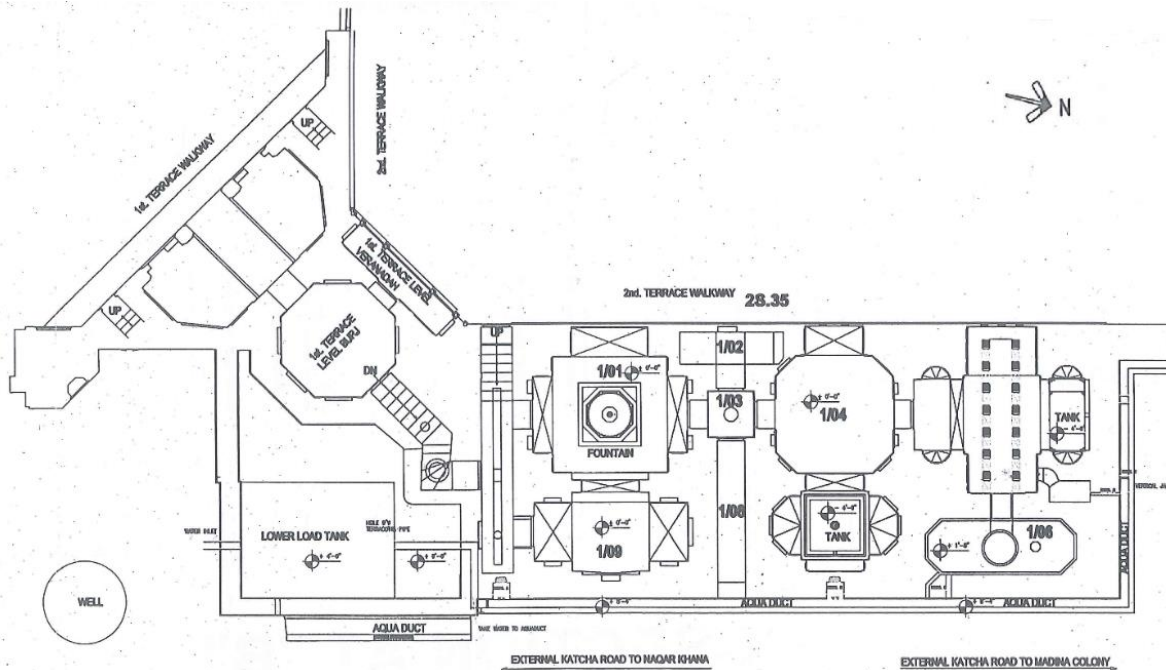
Layout Plan of Shahi Hammam, Shalimar Gardens Lahore
